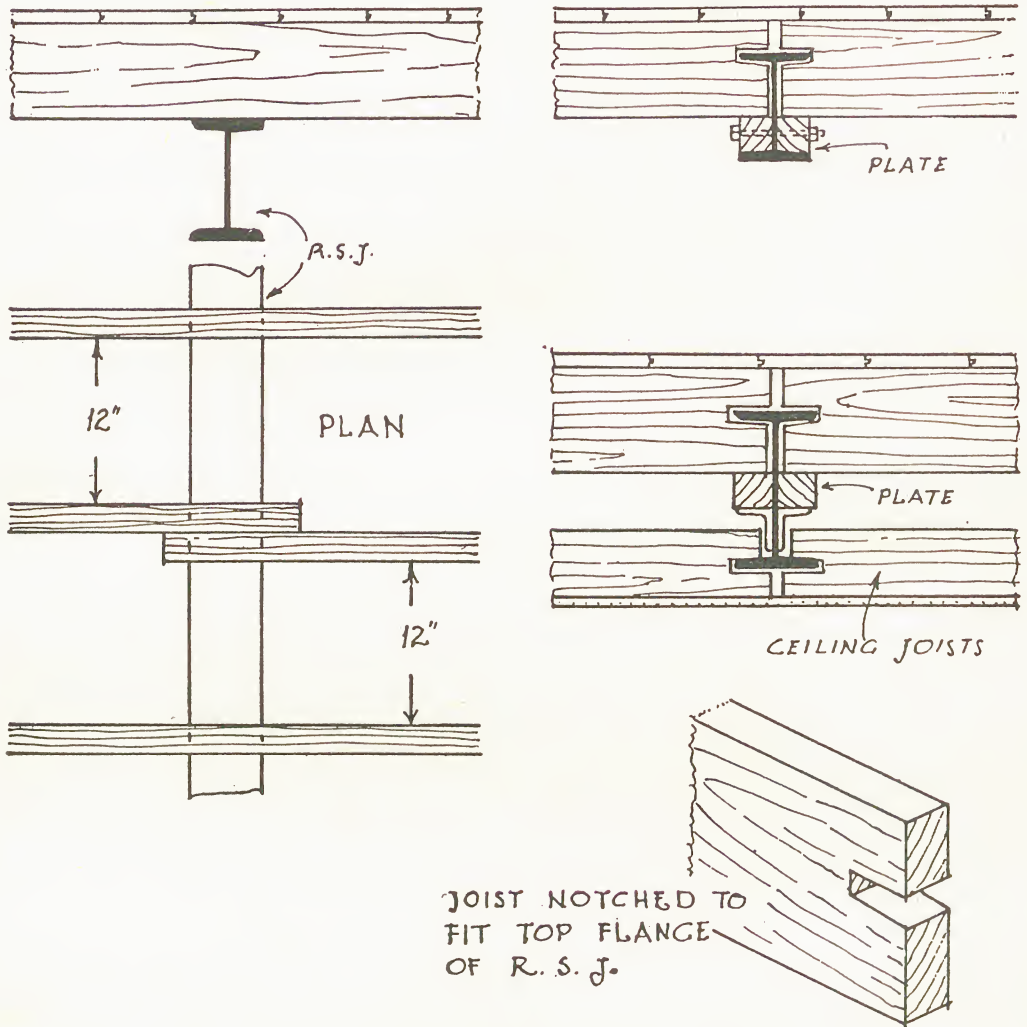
Details of double floors showing how floor joists are supported on R.S. beams.
